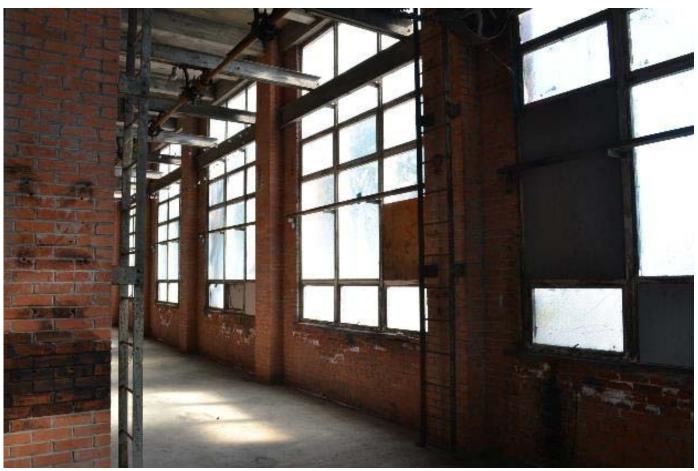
Char House (Resource ID 1), interior, windows on the south elevation
